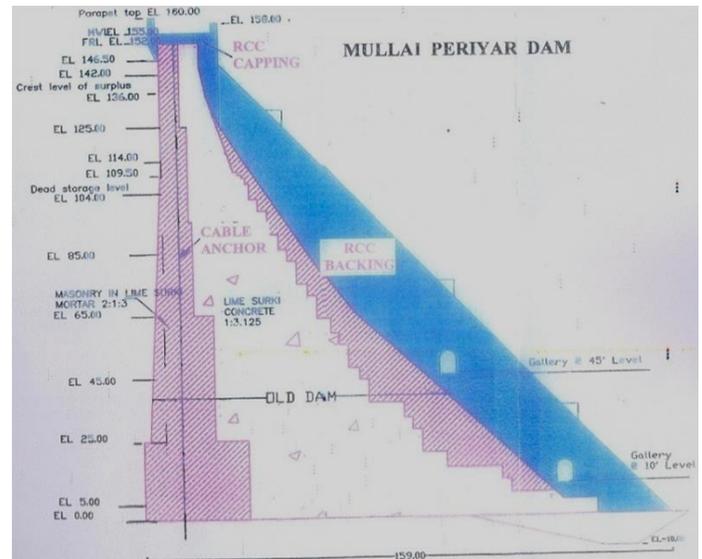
Cross section of Mullaperiyar dam after strengthening²².
